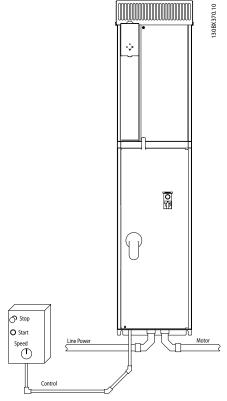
Example of Proper Electrical Installation Using Conduit
